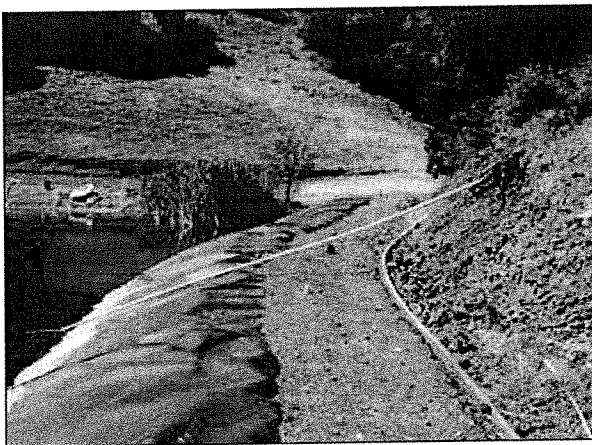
View north of pipe transferring water from the seep within the hillside to the manmade storage pond.
